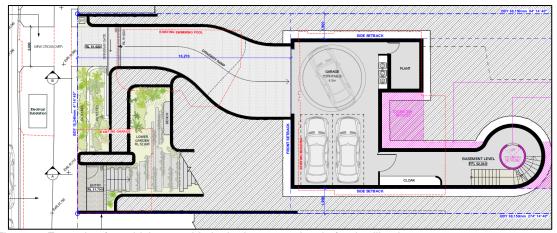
Example of a vehicle turntable in the basement level of a dwelling house
